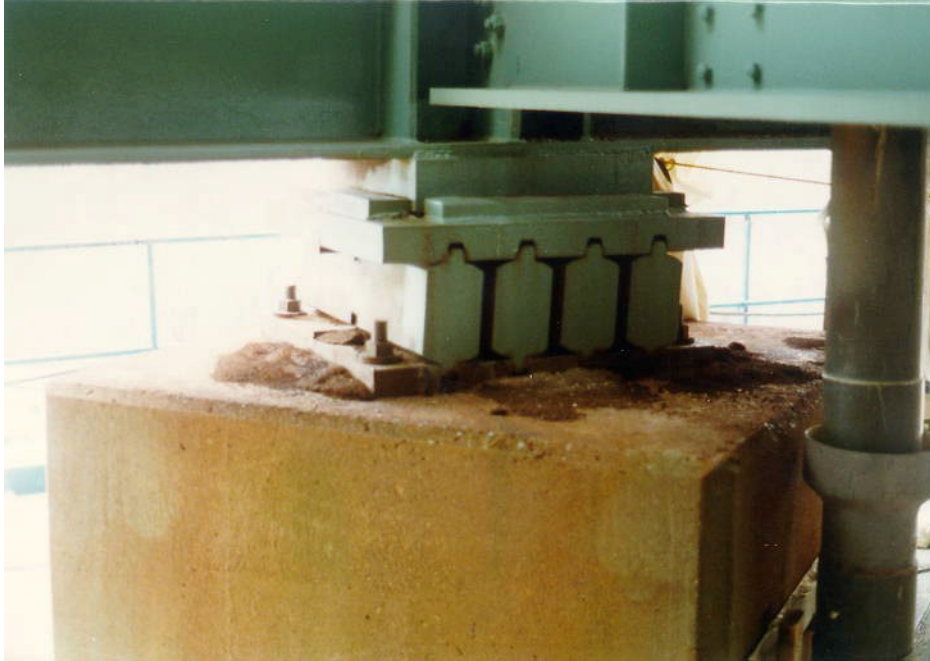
Nested Rocker Bearing Used for Very Large Spans.
